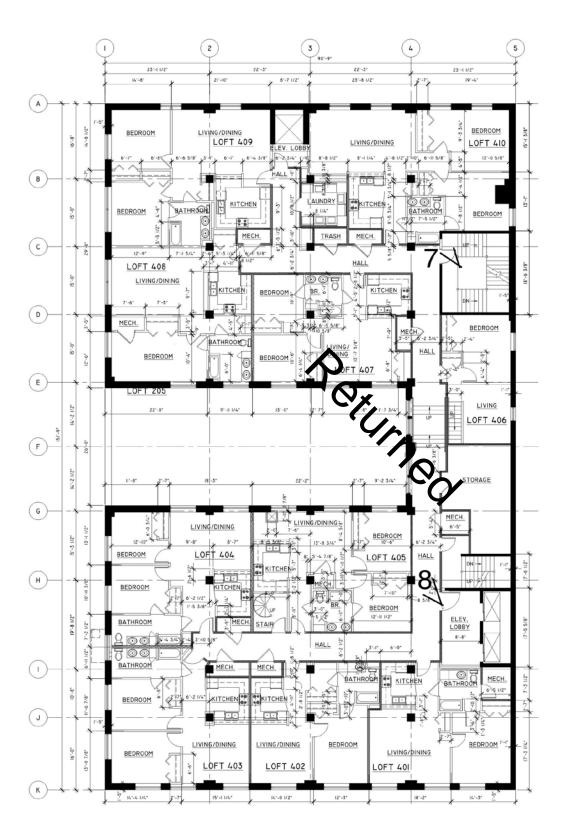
Fourth floor existing plan. Source: Design Build By Architects (2017).
